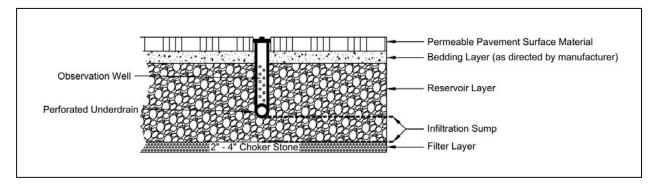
Cross-section of an enhanced permeable pavement design with an underdrain.
